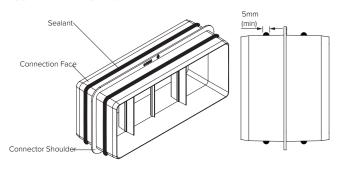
FITTING RECTANGULAR AND CIRCULAR DUCT CLAMP
